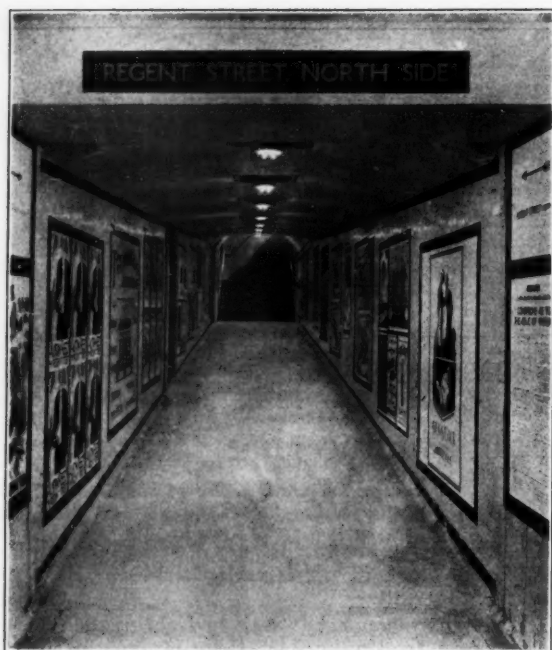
Showing method of Lighting Passages in the new Piccadilly Underground Station.
